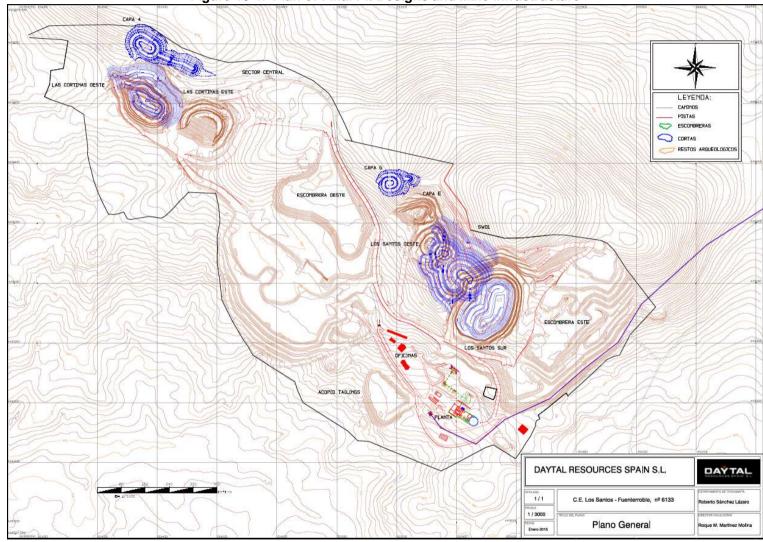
Plan of Final Pit Designs and Mine Infrastructure
